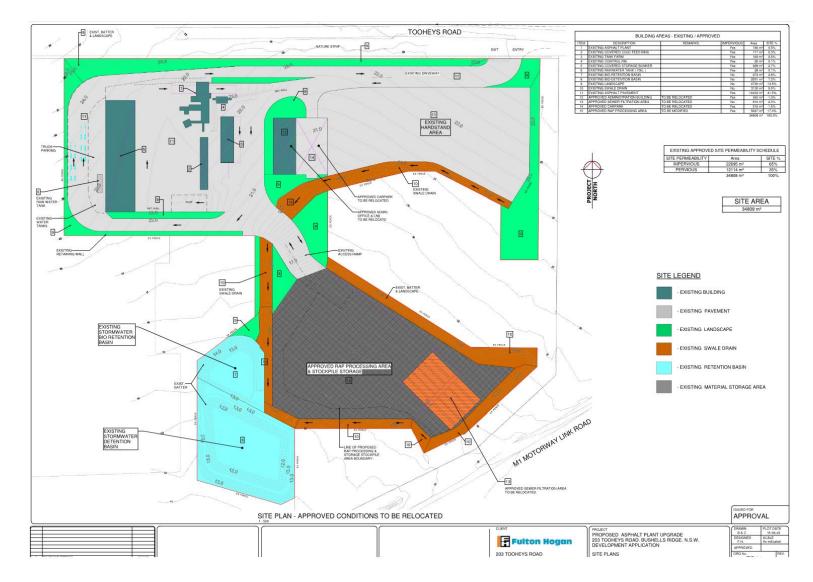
Existing Site Plan to be Relocated showing the direction of flow of the existing swale drain
